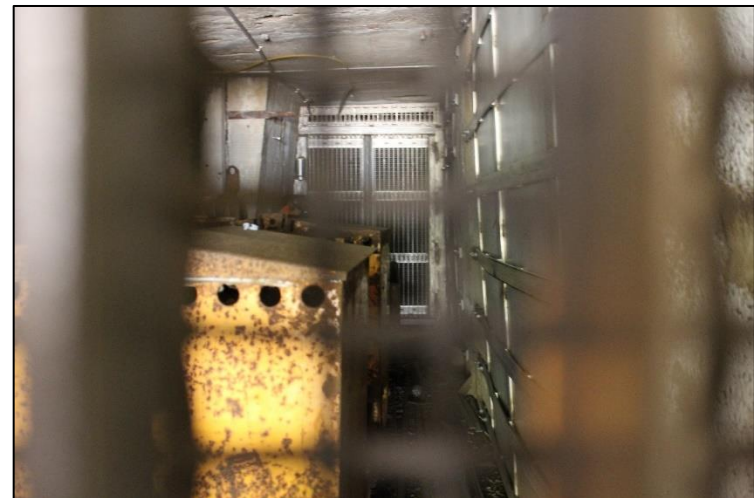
View of Anchor (Daly-Judge) Drain Tunnel entrance, through gate. Note additional modern gate and spalling concrete on ceiling.
